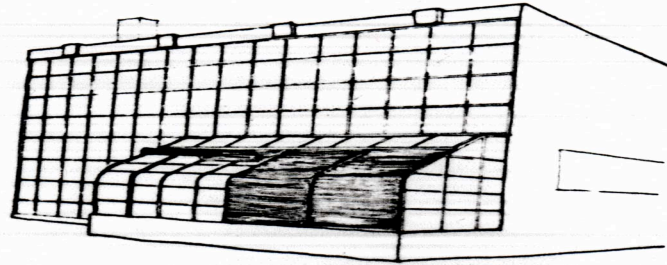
Doug Kelbaugh's House: Trombe Wall and Greenhouse
